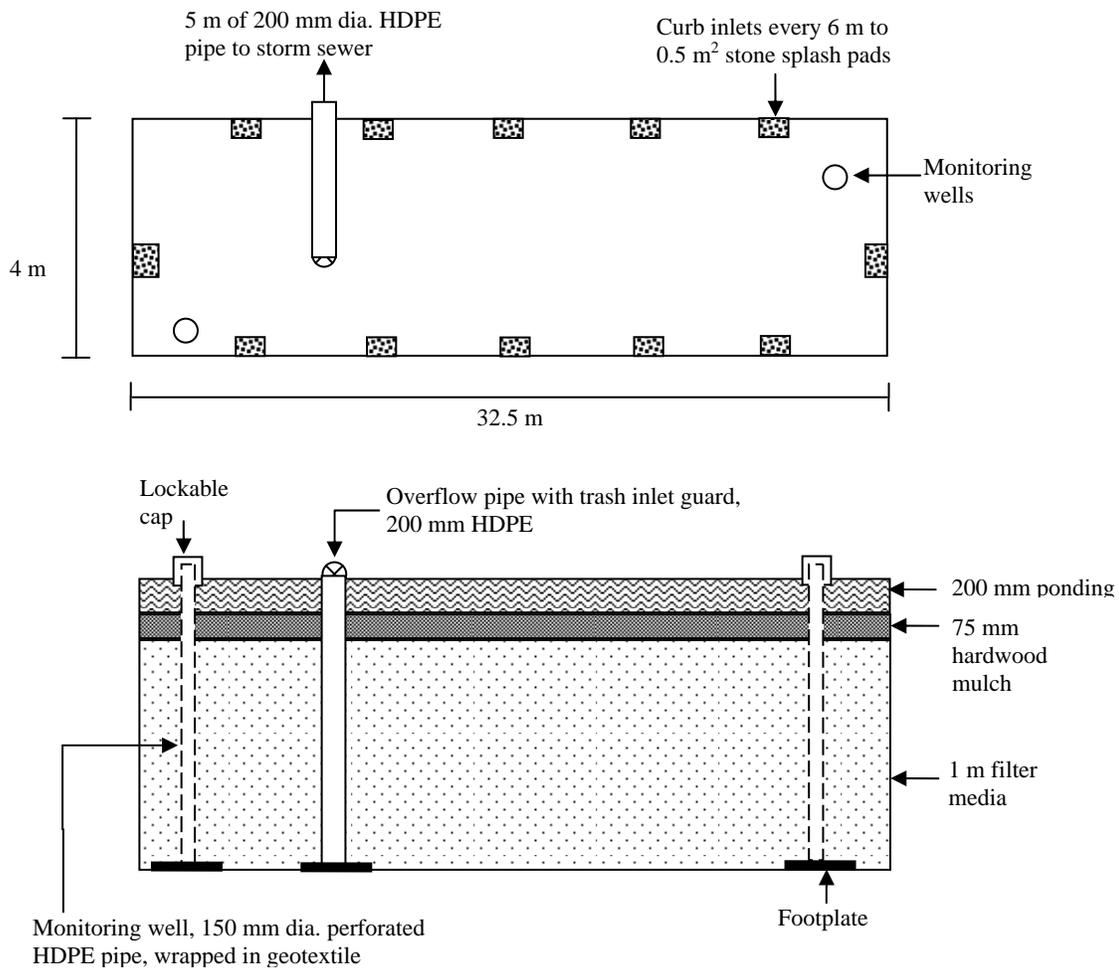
Bioretention full infiltration design. Plan view (top) and cross section (bottom)
